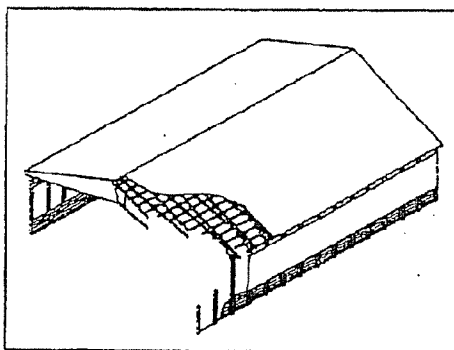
An ideal dry stack storage facility is a roofed structure with an earthen or concrete floor.
